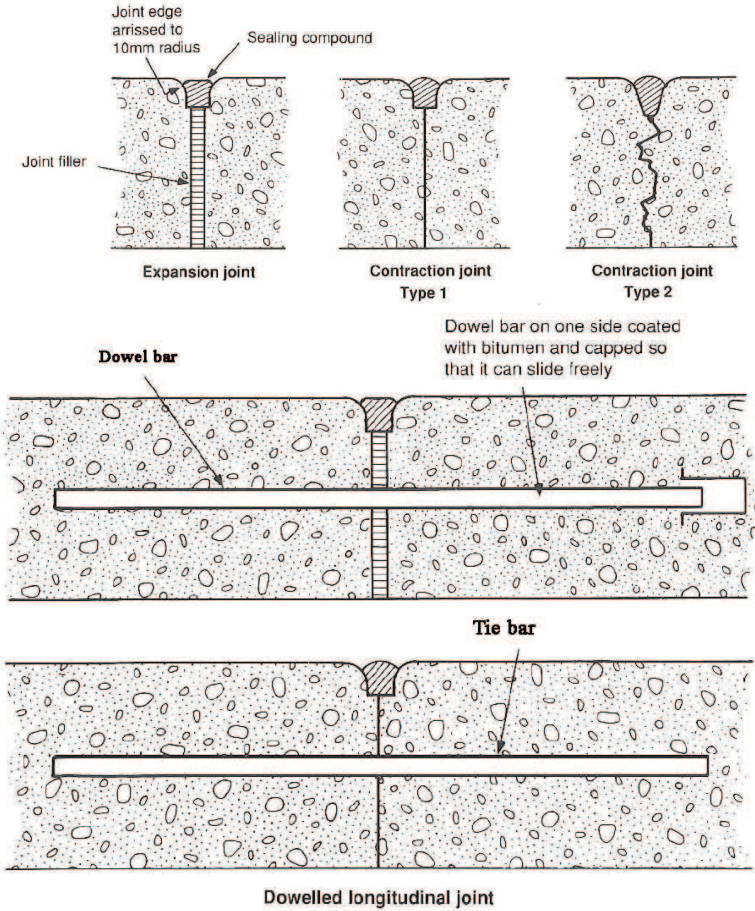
Joints in concrete pavements (adapted from Millard, 1993).
